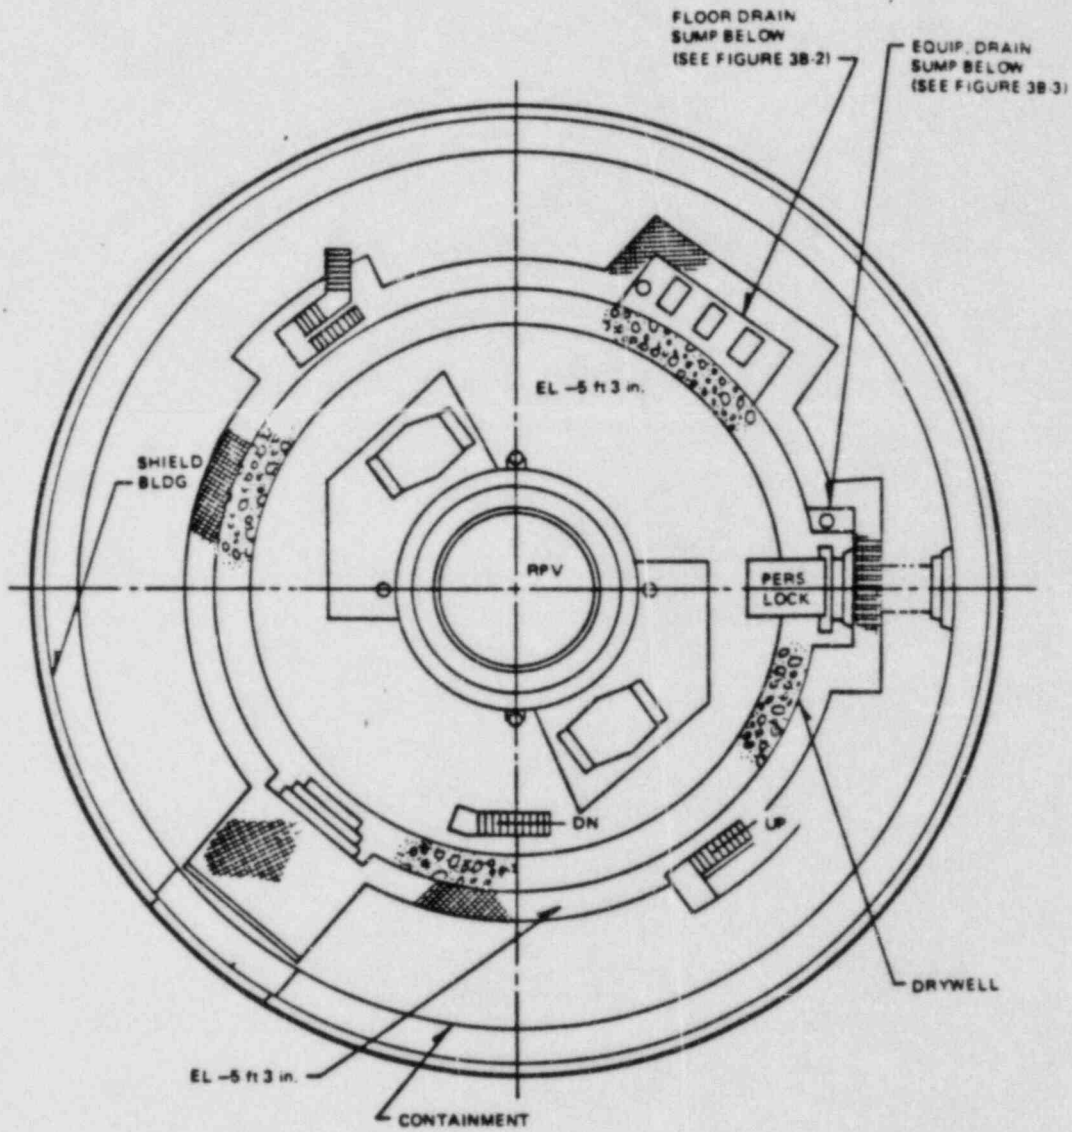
B-4. Plan At Elevation (-)5 Feet, 3 Inches
